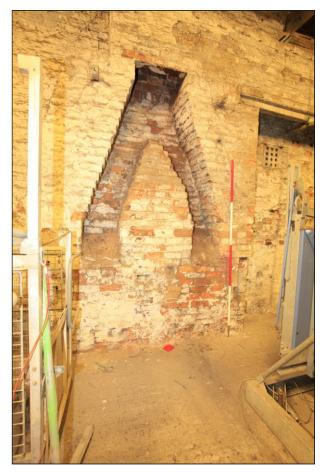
Detail of a typical flue in the east wall of G6 (Film 2.27)
